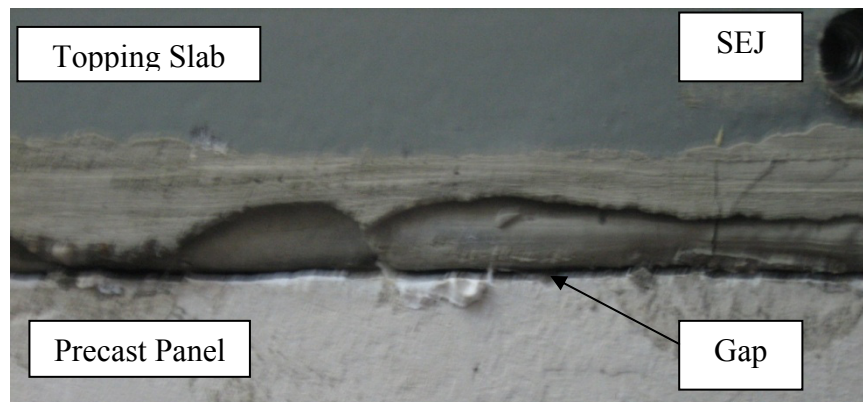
Gap Between Topping Slab and Precast Panel at Failure of Specimen 8
